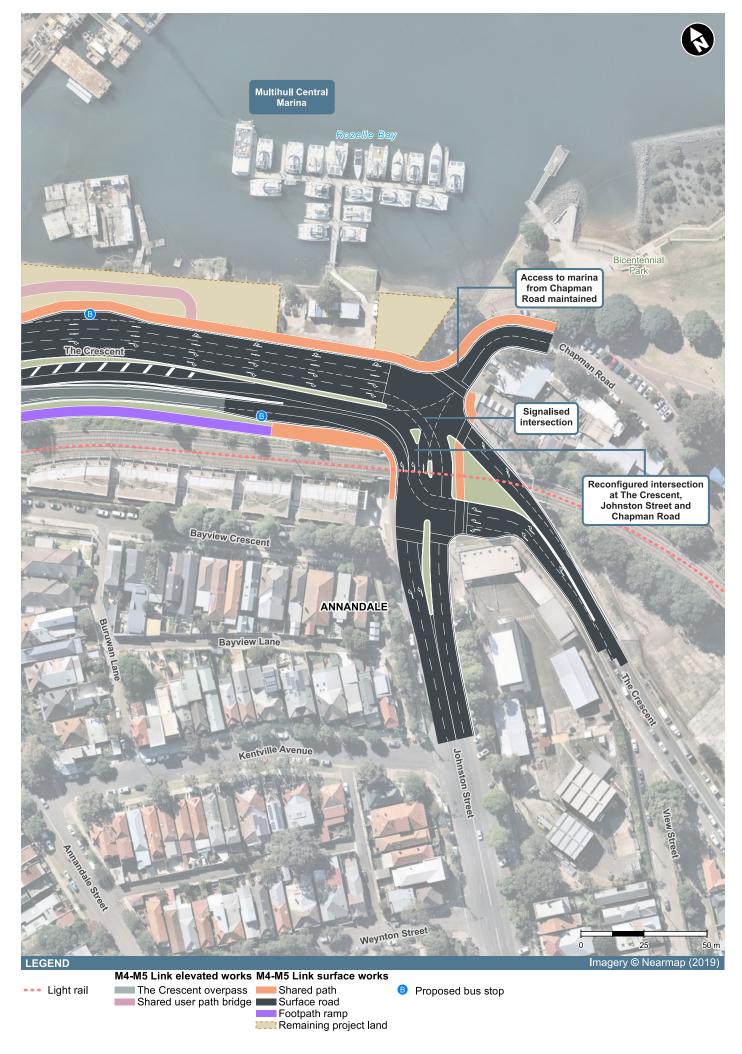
The Crescent/Johnston Street/Chapman Road intersection
